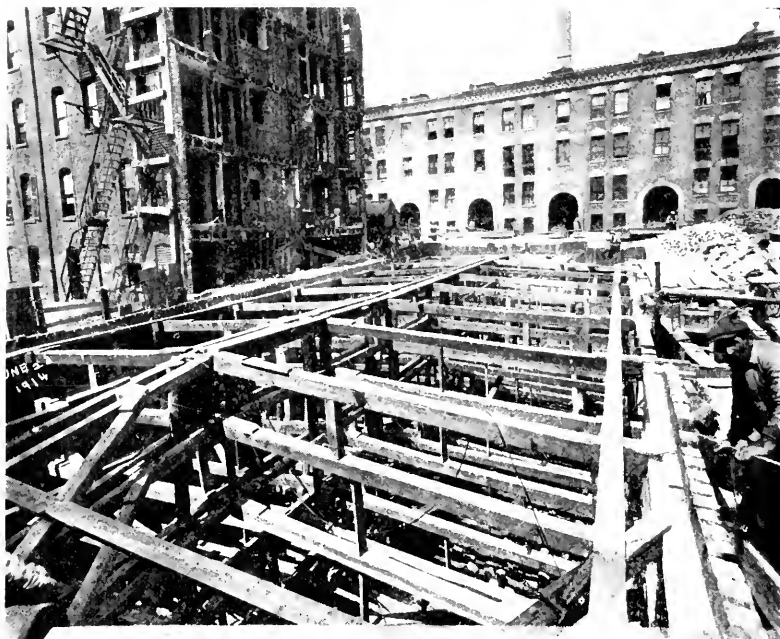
EXCAVATION AT PUMPING STATION SITE, SHOWING UPLIFT OF BRACING.
